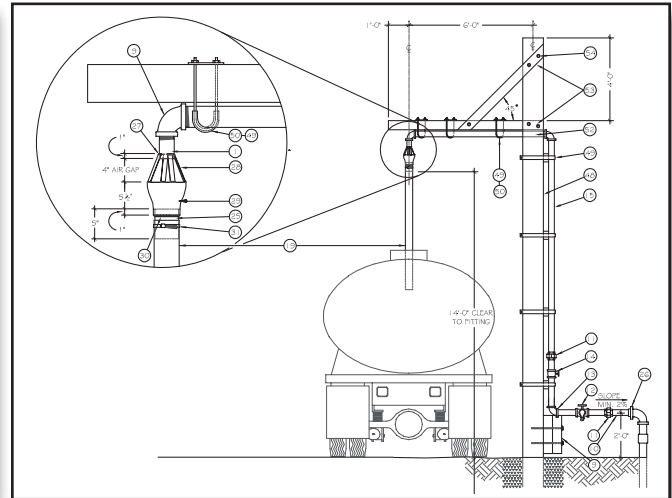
Part of the elevation view of the air gap-type fill station with a wooden tower from the water tanker fill station plans.
